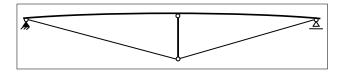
Example of system with internal indeterminacy, beam trussed with sag rod
